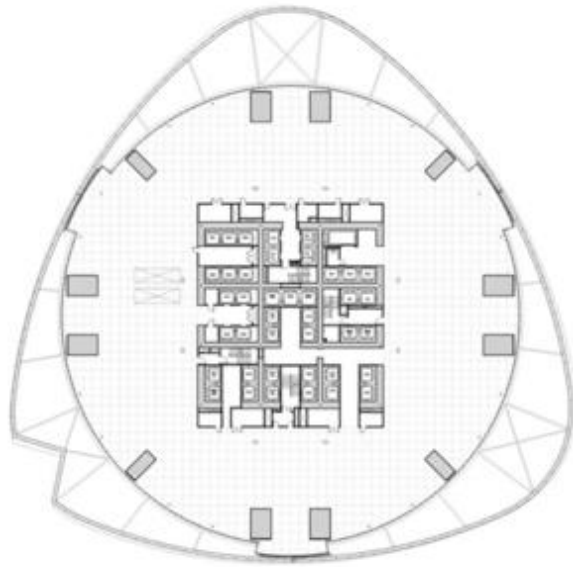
Floor plate of Shanghai Tower. (Source: The B1M, 2020)
